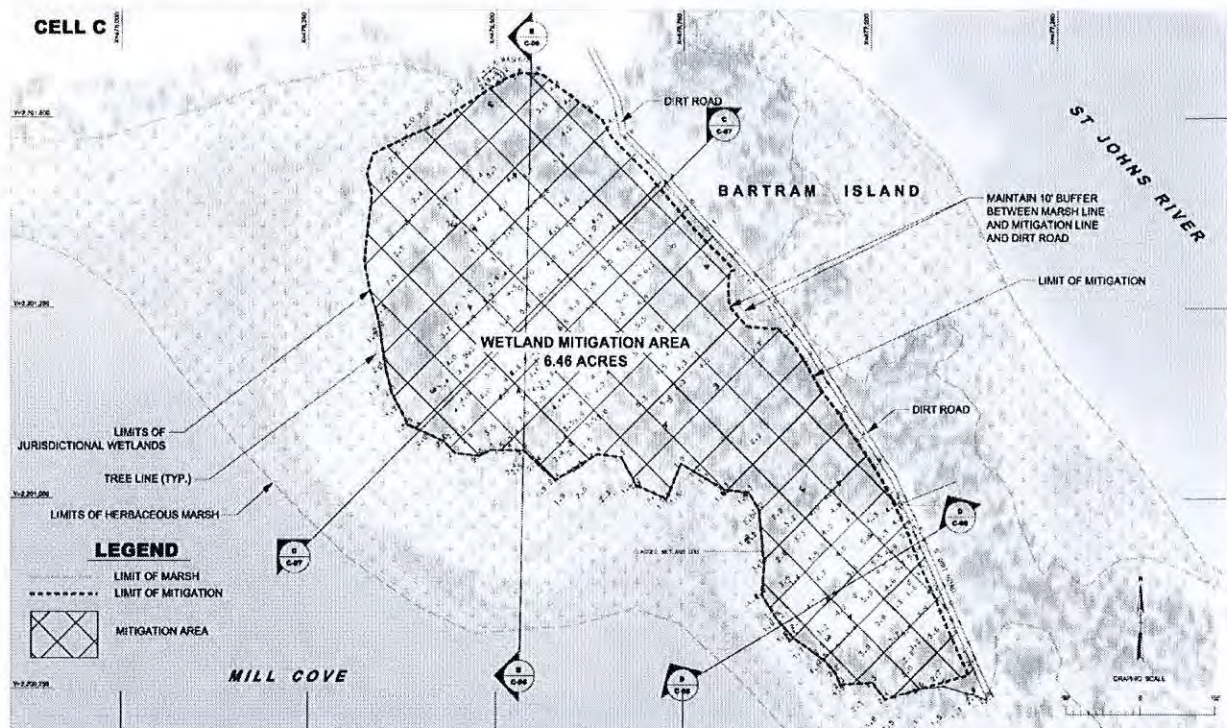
(Permit Plate C-05). Plan view of mitigation area to be created as a salt marsh from existing upland.
